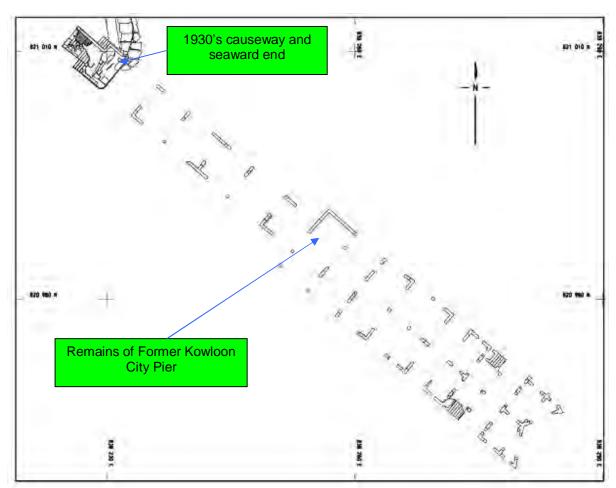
Plan of Seaward End of Longjin Bridge, 1930's causeway, Supporting Pillars and Landing Steps of Former Kowloon City Pier
